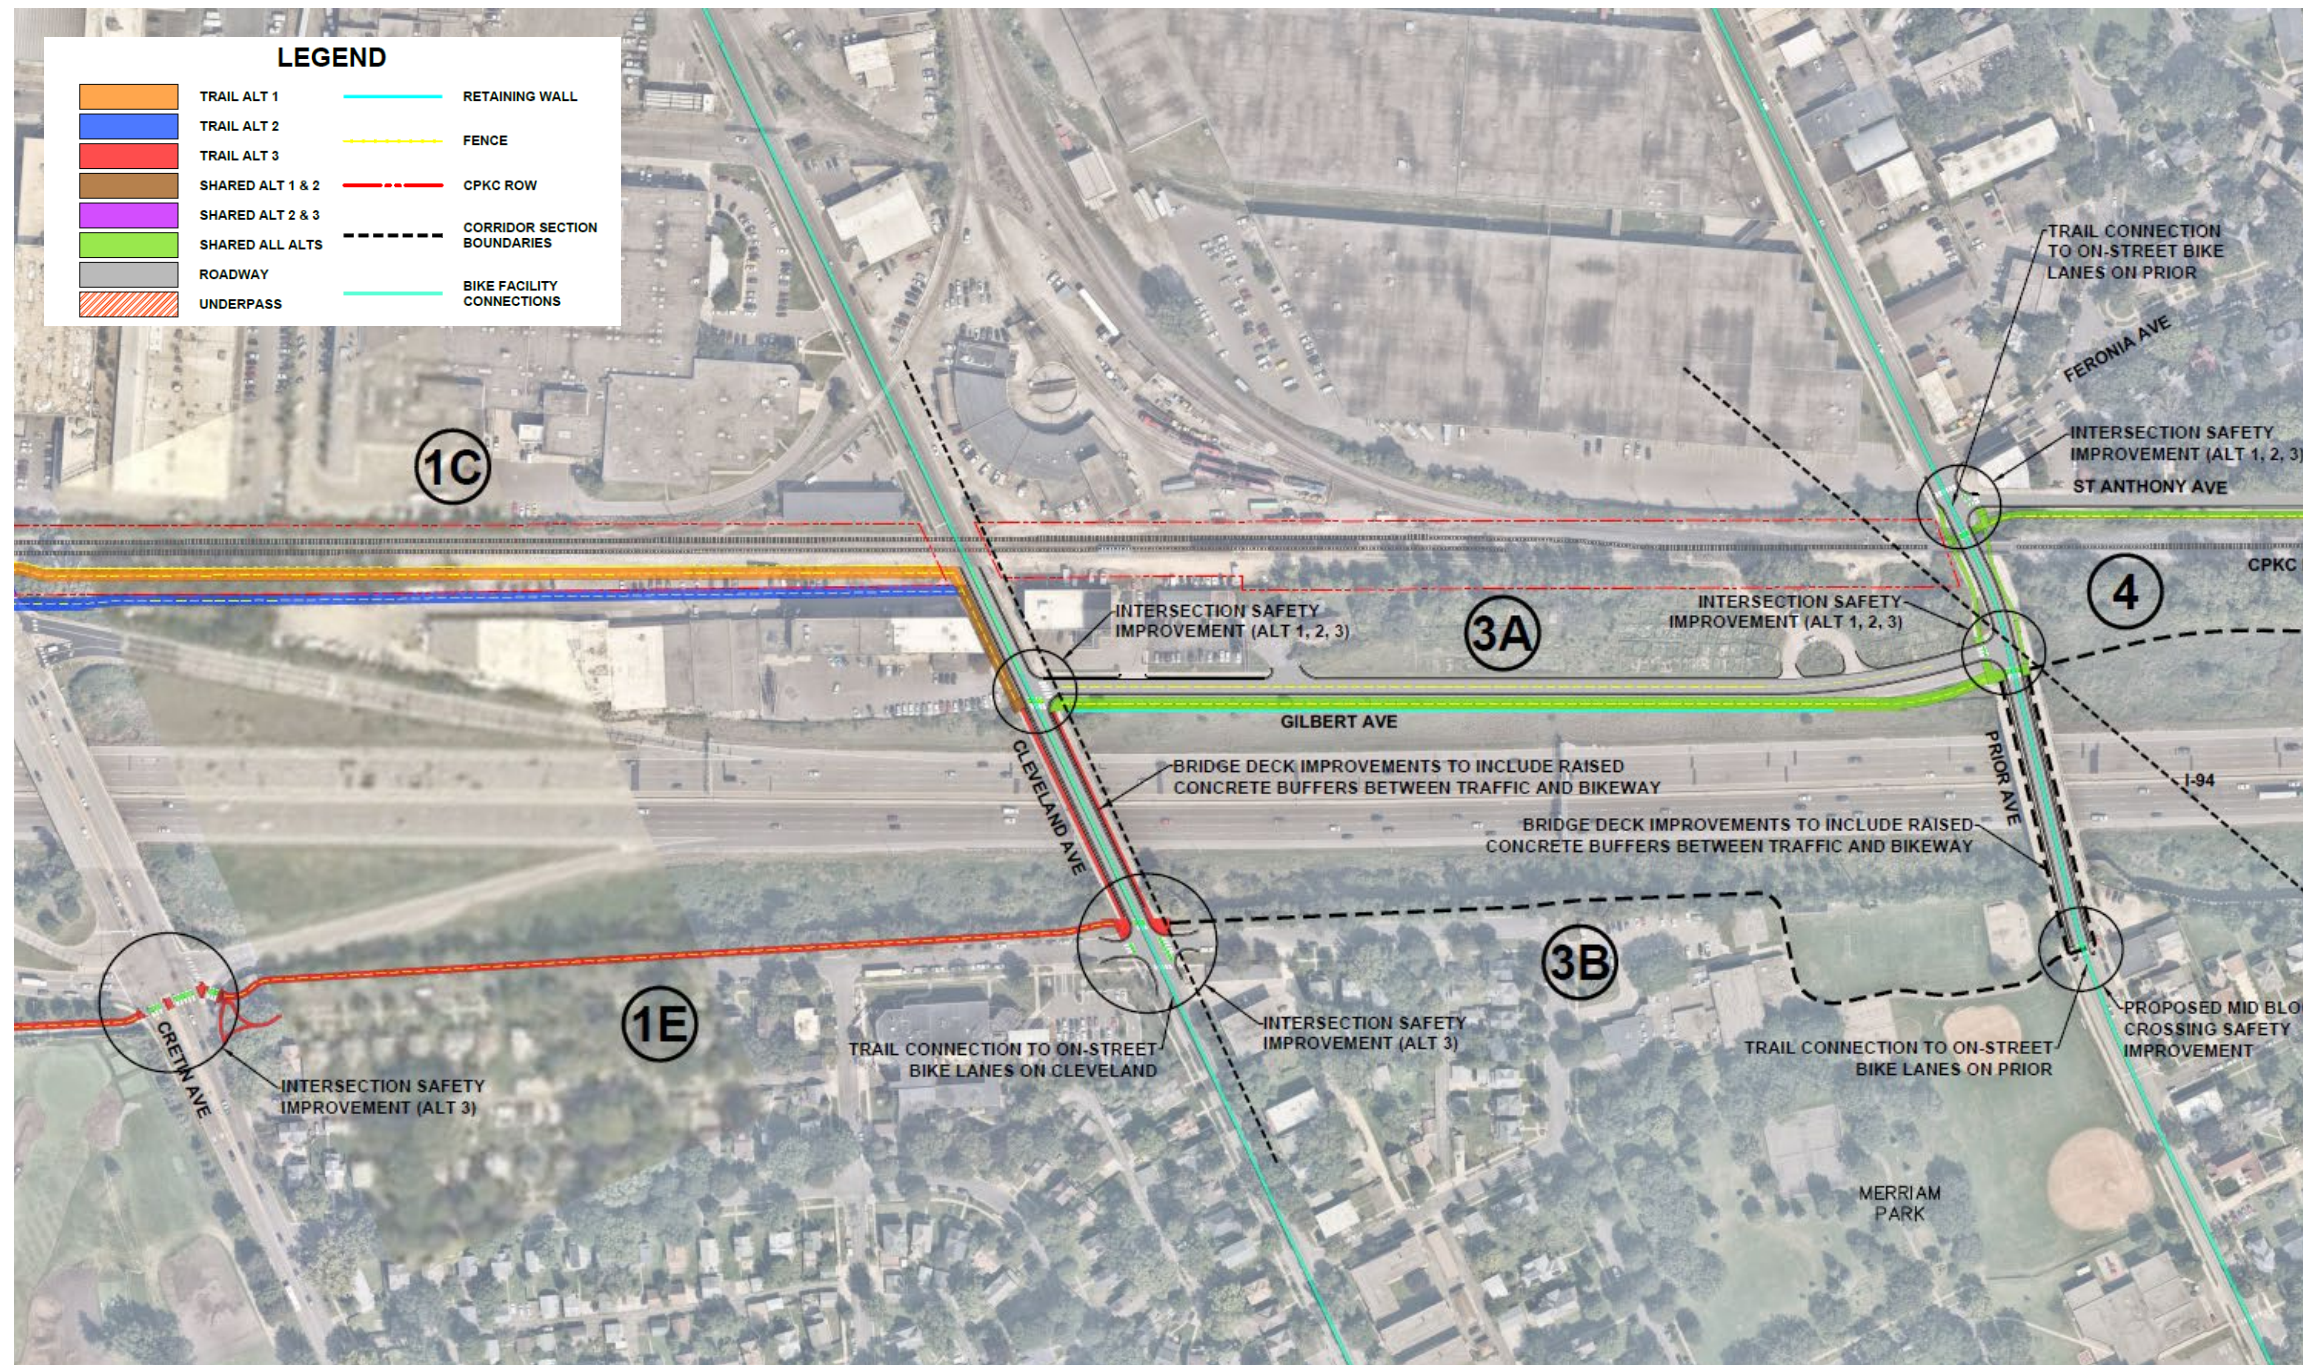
Corridor Alternatives from Cretin Ave to Prior Ave
